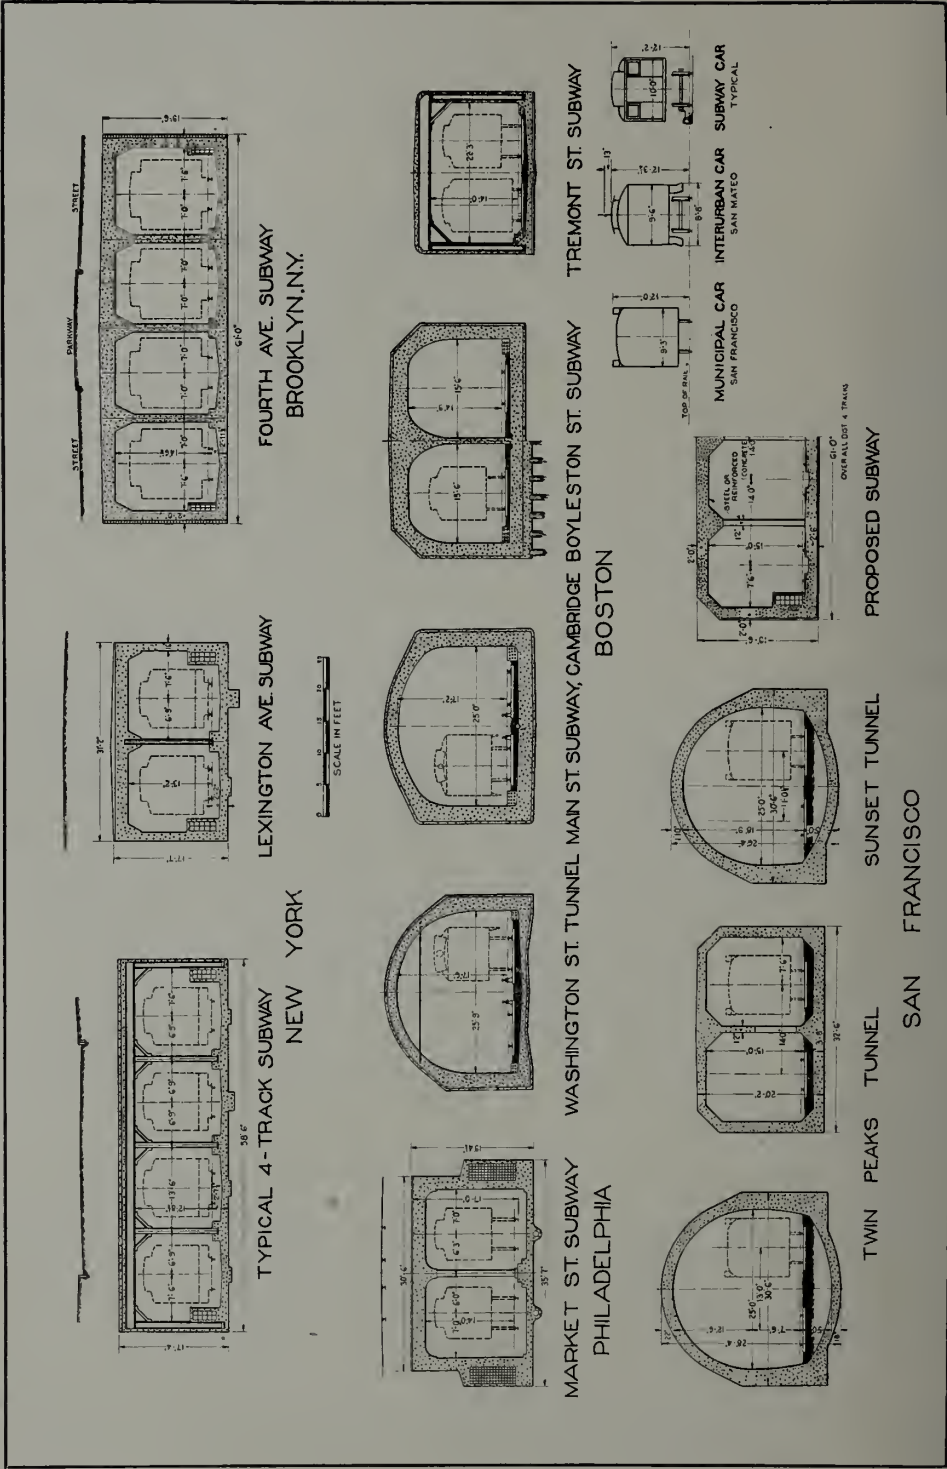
PROPOSED SAN FRANCISCO SUBWAY SECTION COMPARED WITH EXISTING SUBWAY SECTIONS. Horseshoe section is necessary where heavy external pressures are present. The flat top section is most suitable for cut and cover type of construction.
